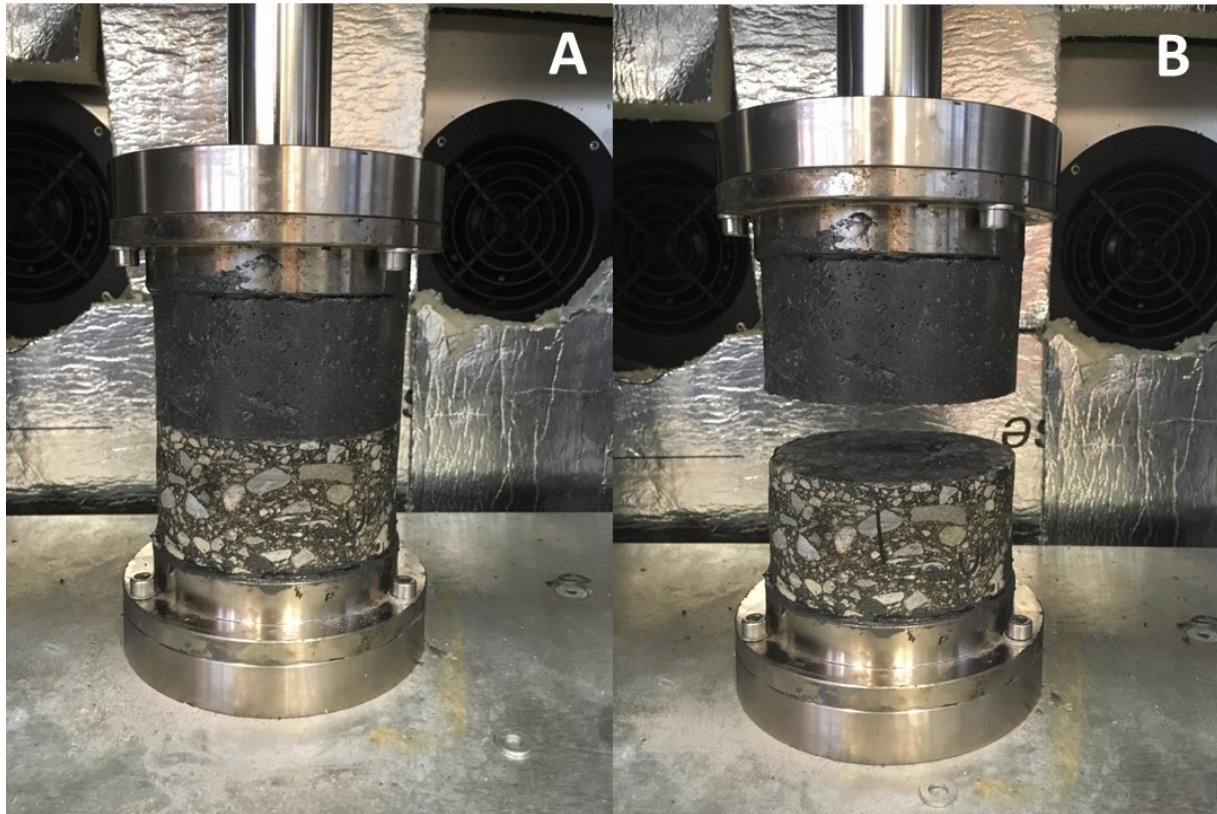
Bond strength testing apparatus and specimen (road patch material topping asphalt pavement core): before (A) and after (B).
